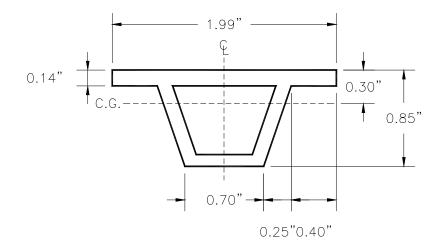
Trapezoidal Section Dimensions of Propylene Specimen
